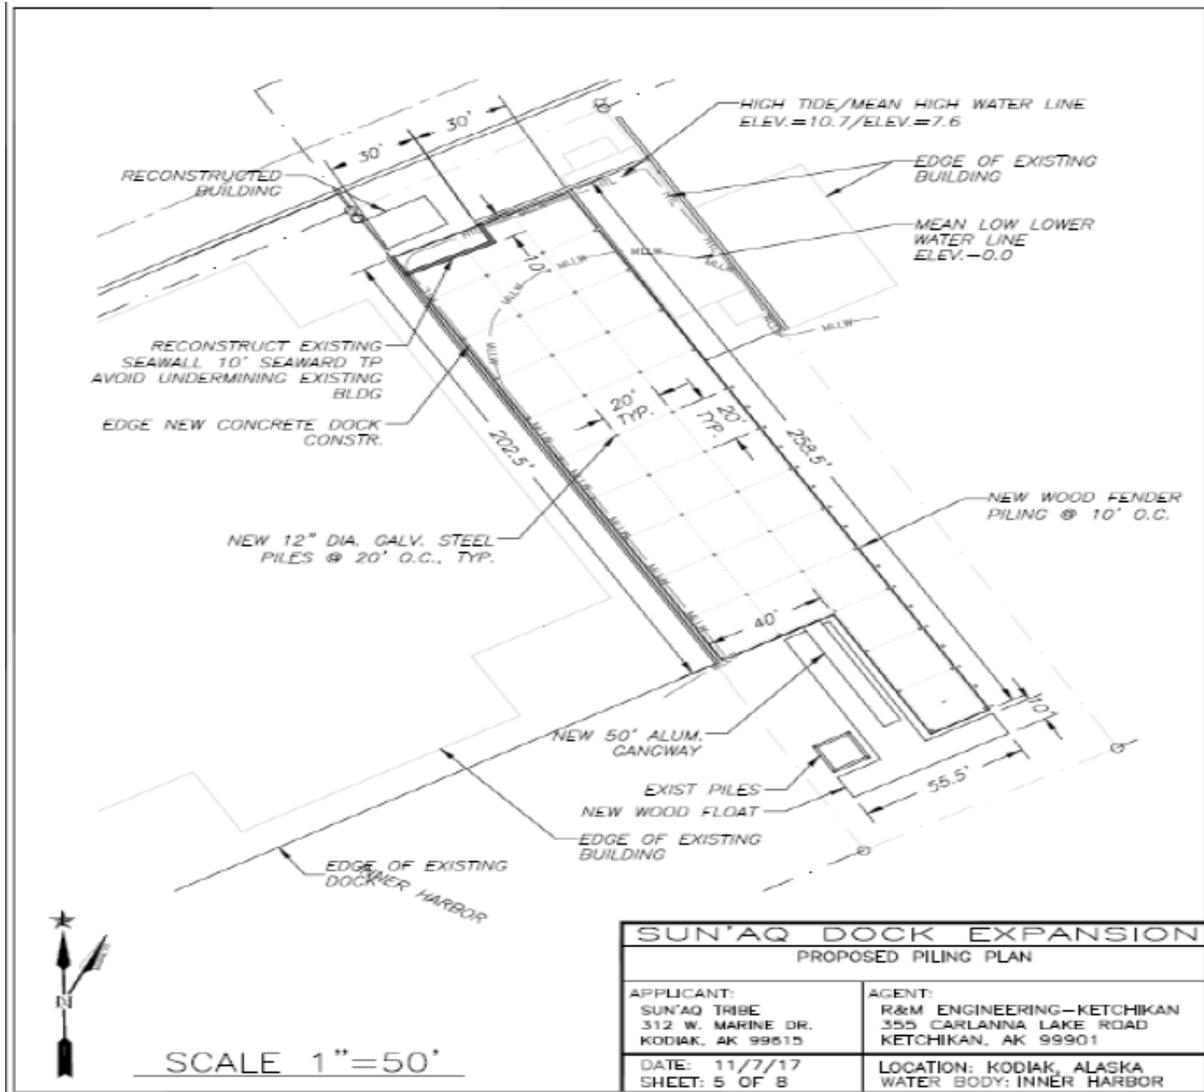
Proposed piling plan for the Sun'aq Tribe's dock expansion.
